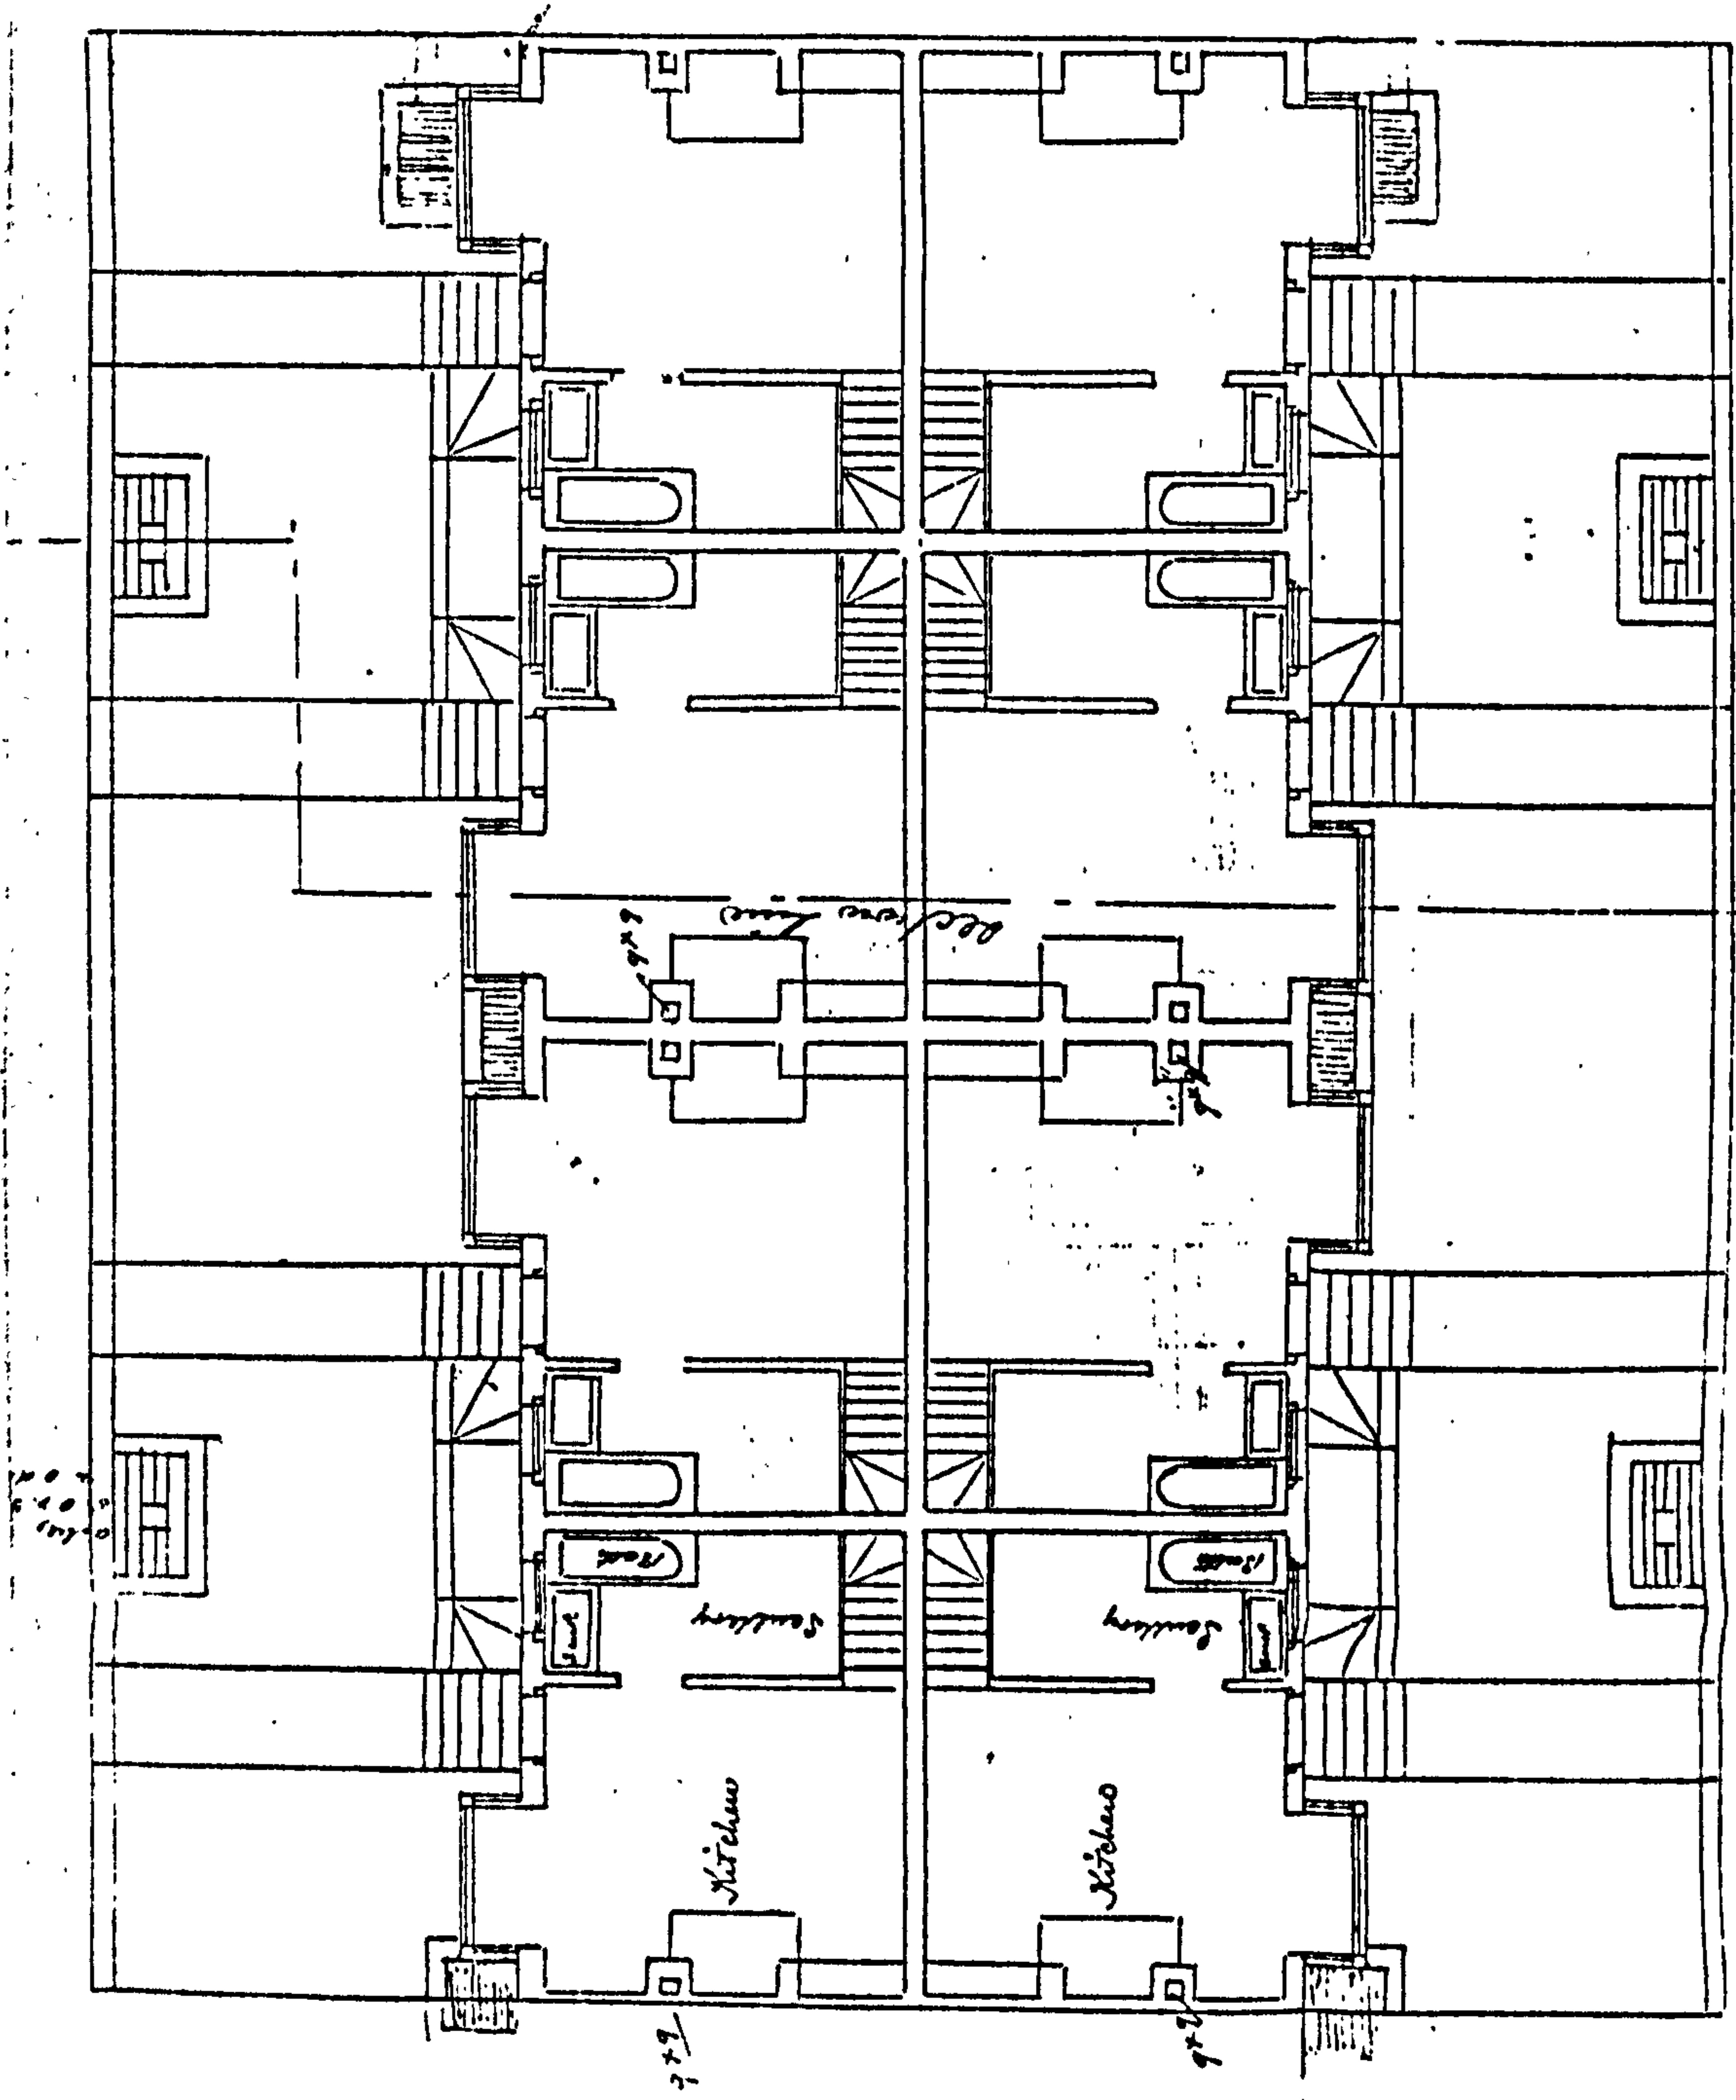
Deposited ground floor plan of 14 back-to-back houses and four shops, Brudenell Street and Royal Park Place (R.A. Bullivant 1887).
